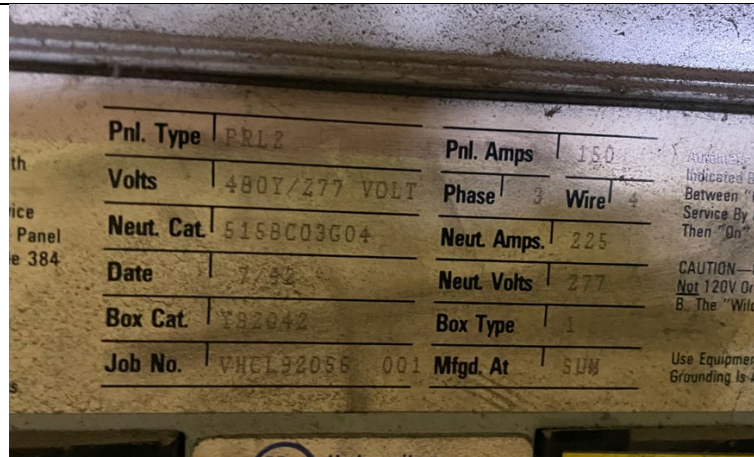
Panel PE on west side of Warehouse A, used for switching outdoor lighting.
